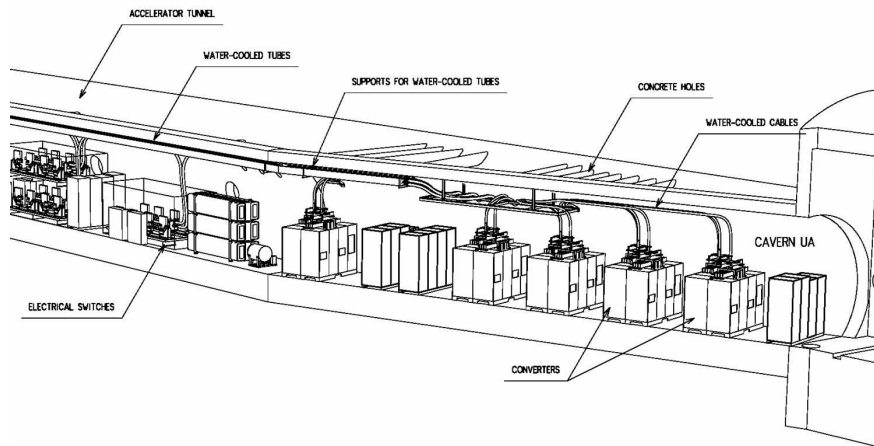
Example of a lay-out for the installation of DC cable systems
